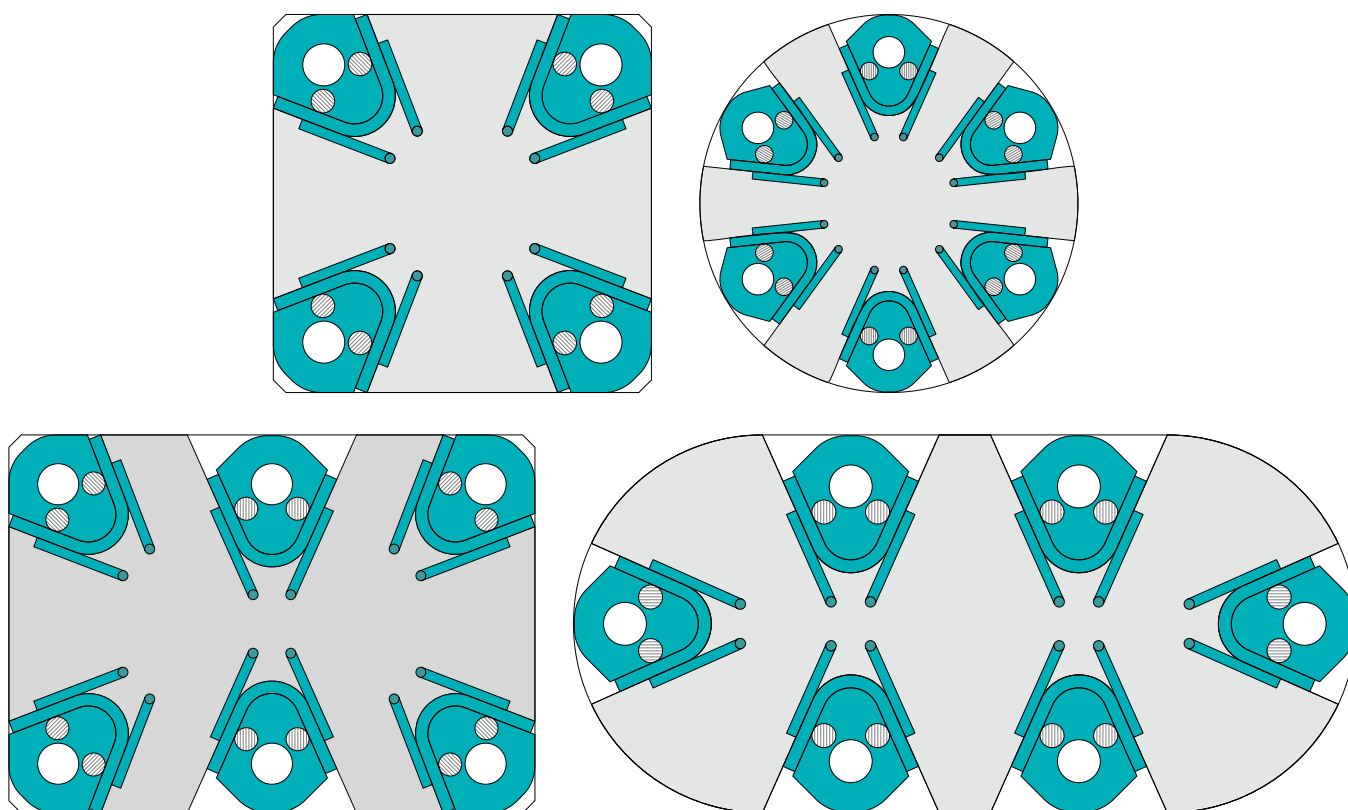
Arrangement of HELKA® Colum Shoes in different column cross-sections.
